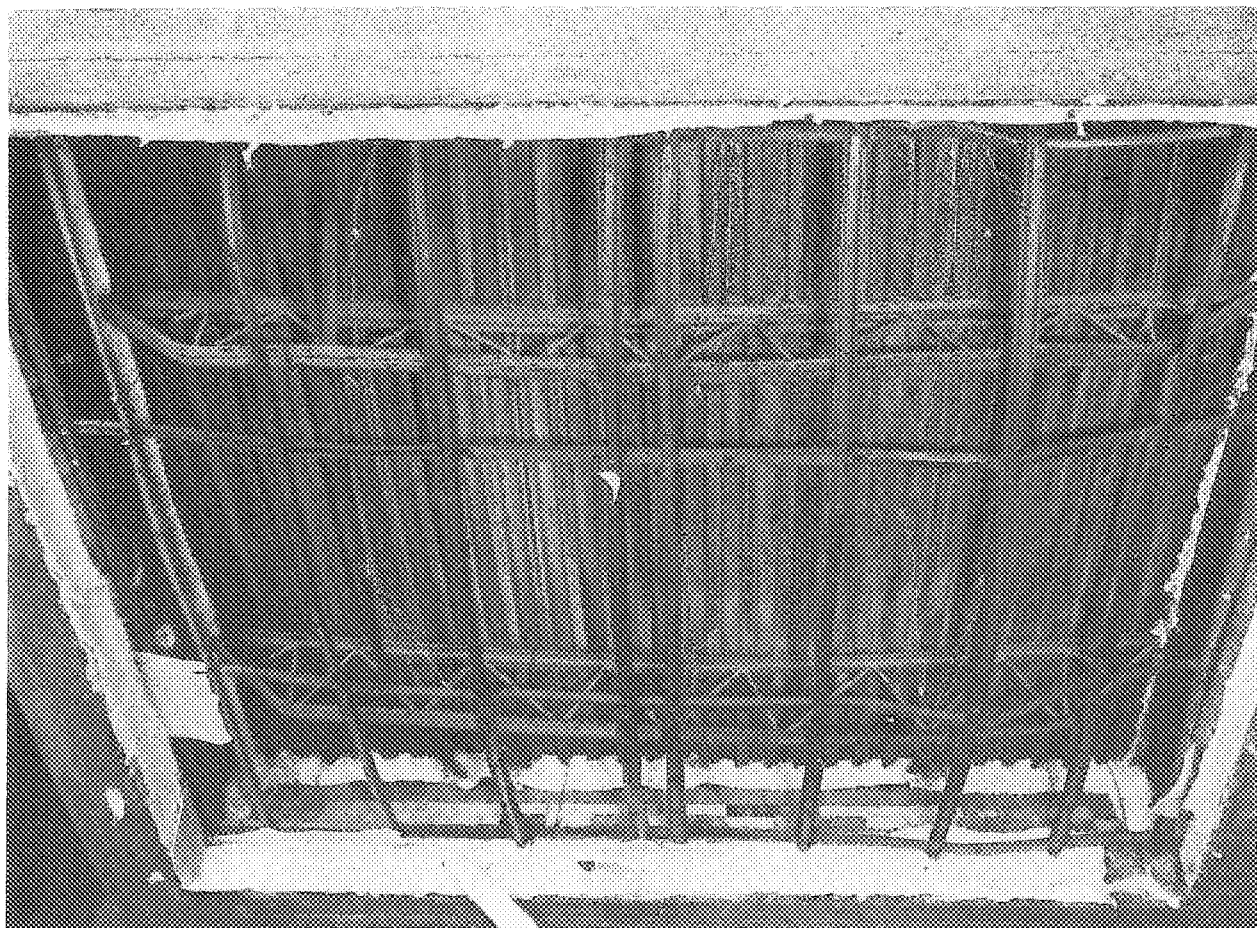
ASSEMBLY NO. 1 AFTER FIRE TEST
